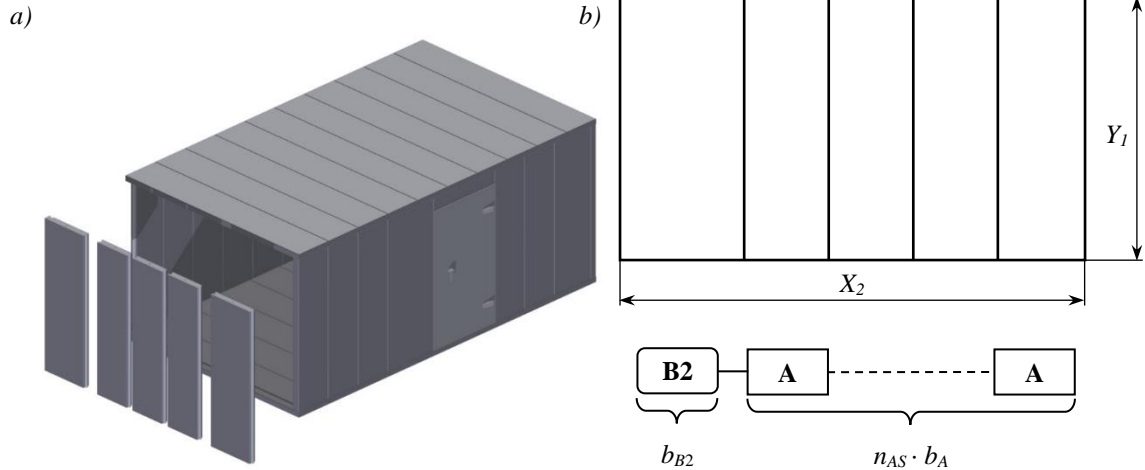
a) 3D view of the disassembled MSR side wall; b) MSR side wall structure and parameters
